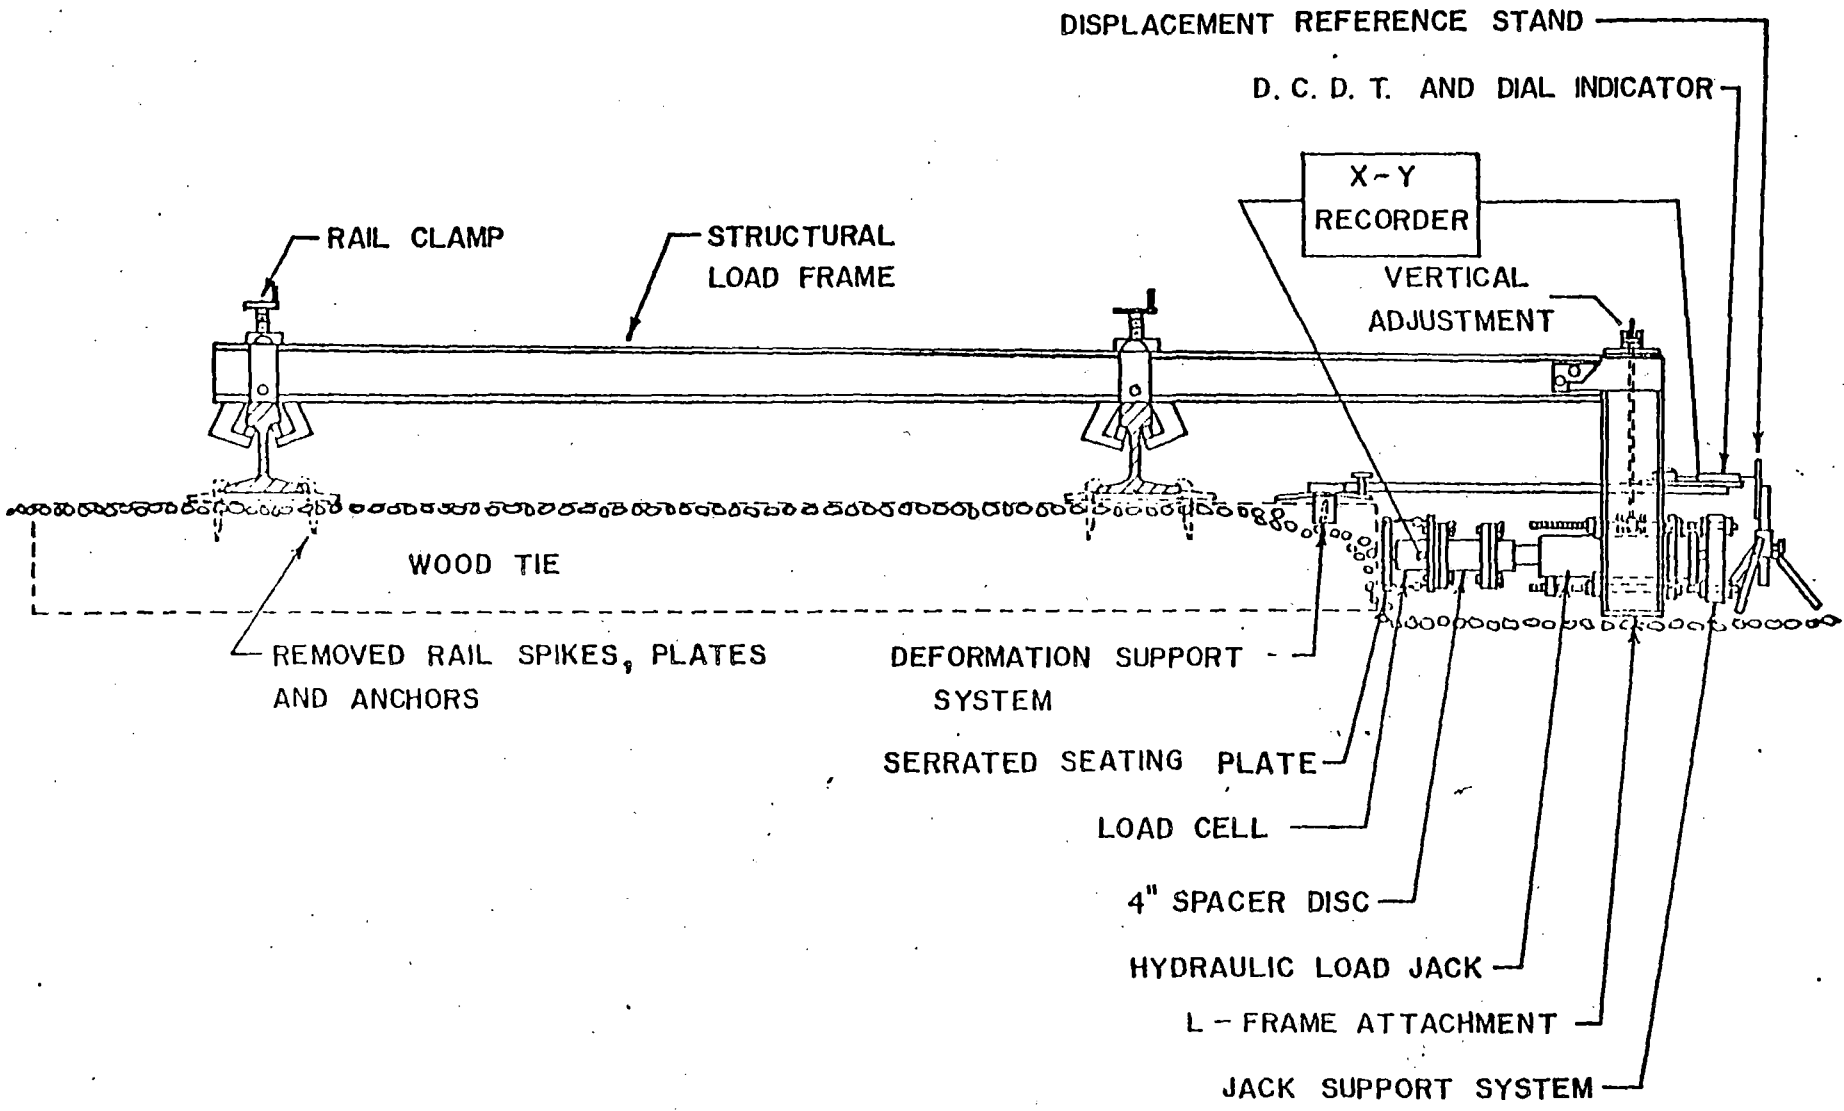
ASSEMBLED LATERAL TIE PUSH TEST APPARATUS
